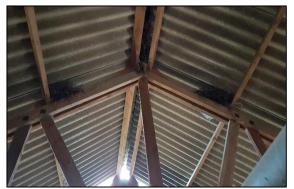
Building 3 - unlined corrugated roof with narrow beams.
